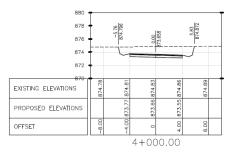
Langa Dam – Cross sections of access road to tunnel outlet portal and Langa Dam Option 2
